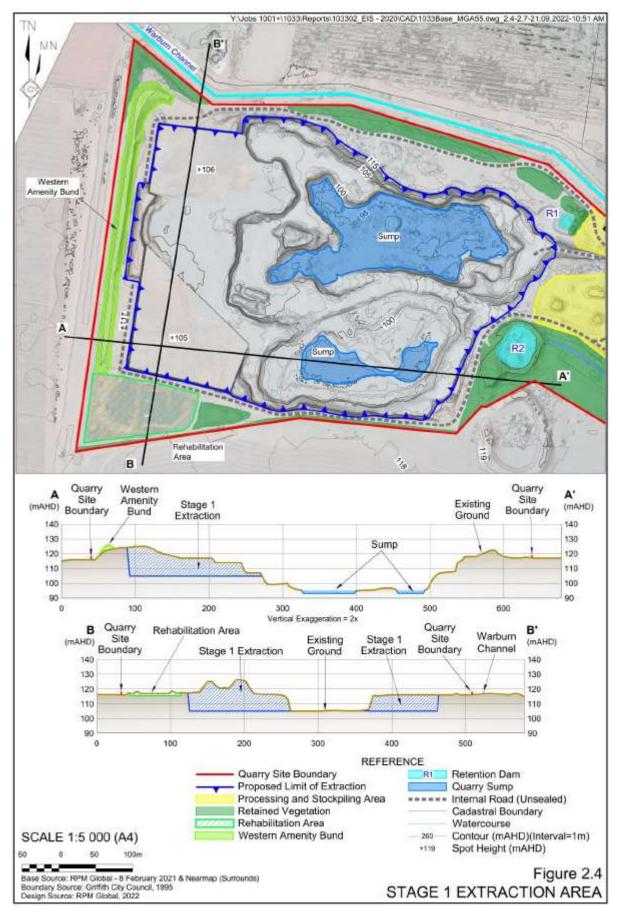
Proposed Extraction Stage 1 and Cross-Sections
